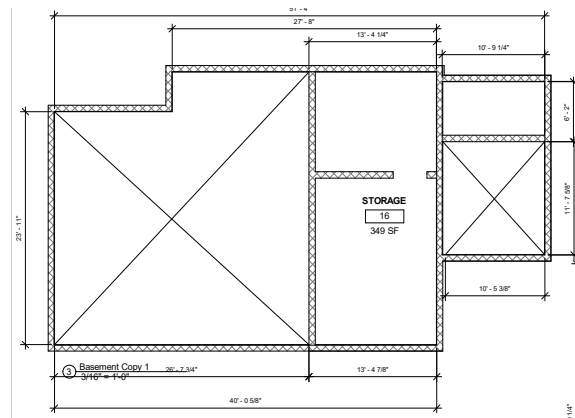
Carmen's basement floor plan (Life Safety Plan)
